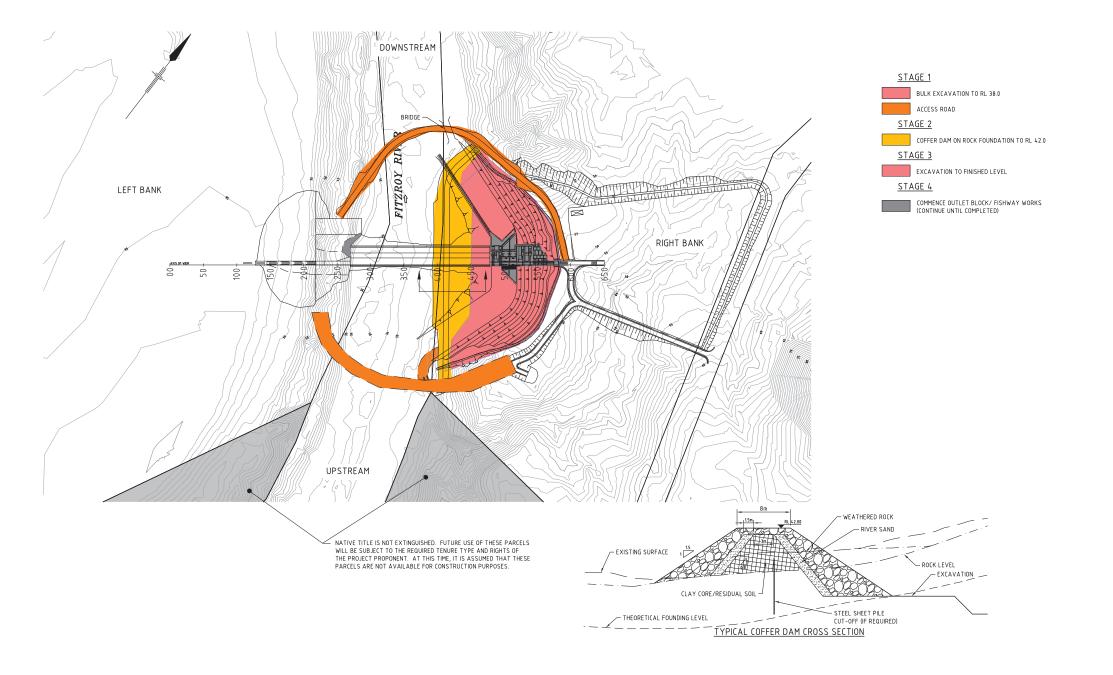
Rookwood Weir construction sequencing (Sheet 1 of 4)
